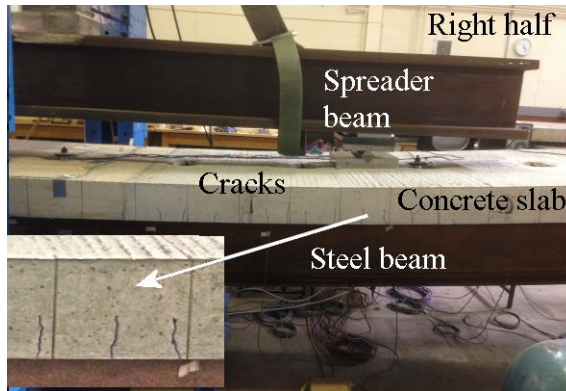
Cracks in concrete slab during composite beam test
